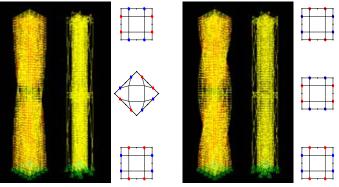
60-story twisted outrigger structures with rates of twist of 1.5 and 3 degrees per floor.
